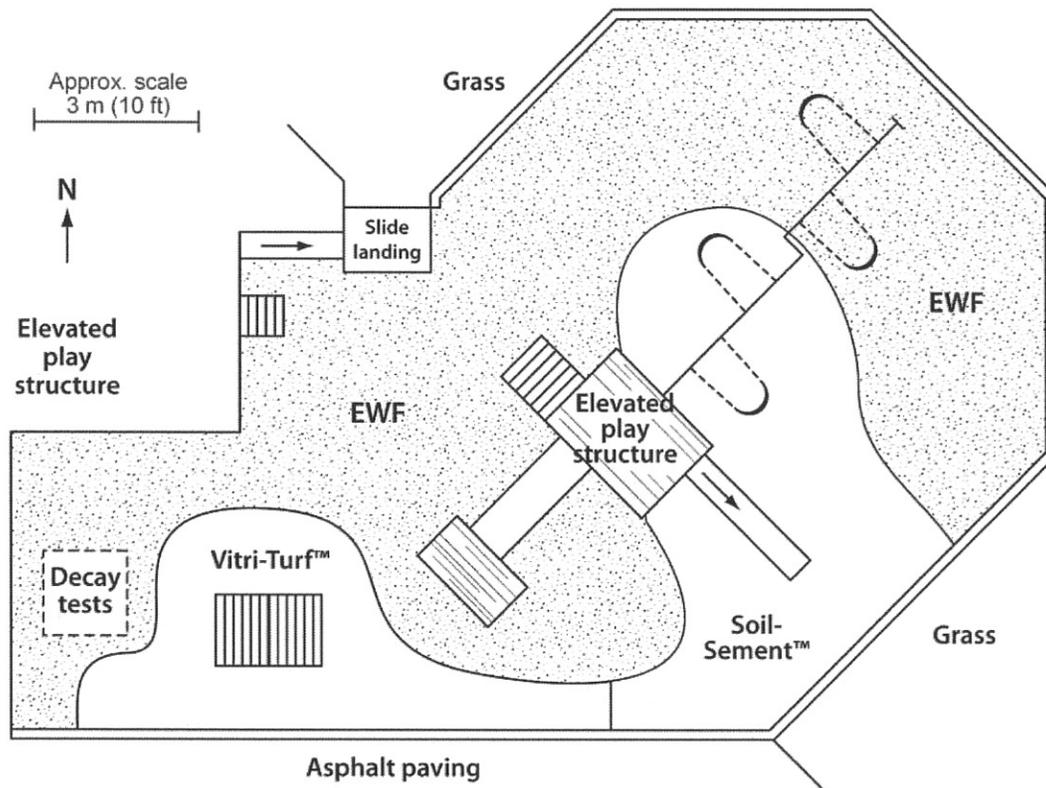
Schematic plan of playground site at Governor Nelson State Park.
